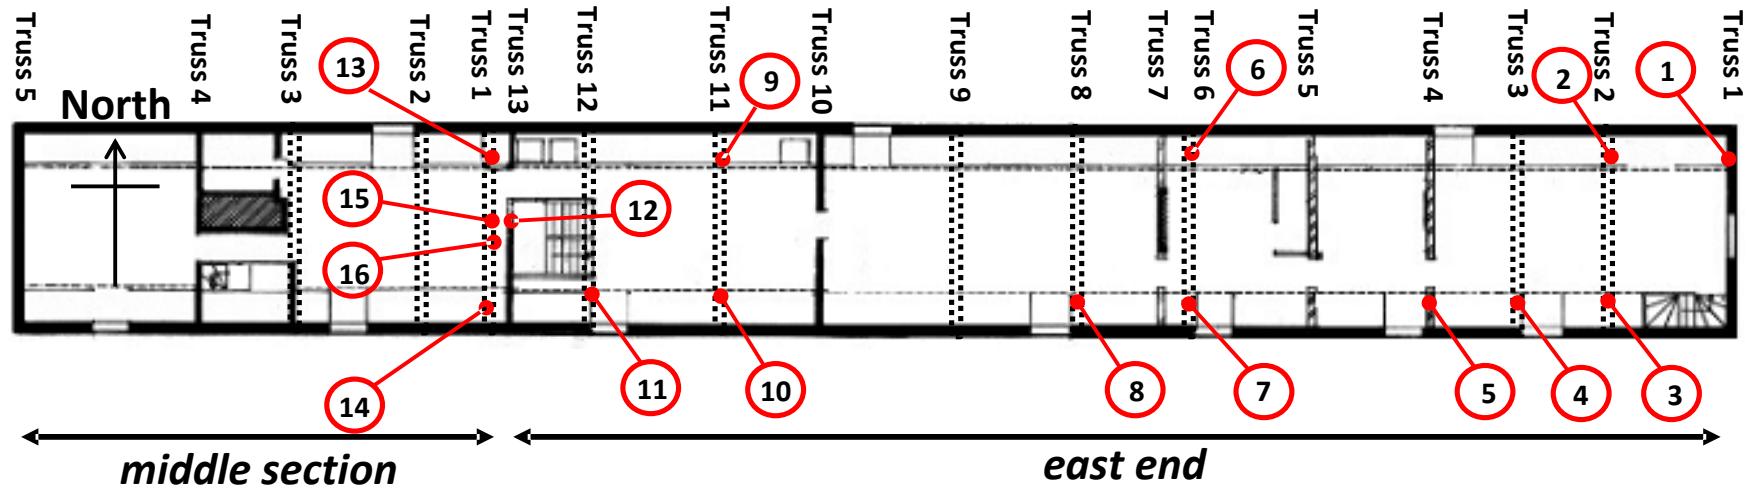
Simple plan of the hall range at roof level to help locate sampled timbers
